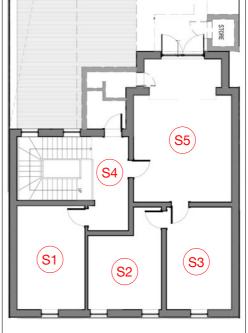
(left) 1873 second floor plan. source: Reproduced from the Portland House CMP.
